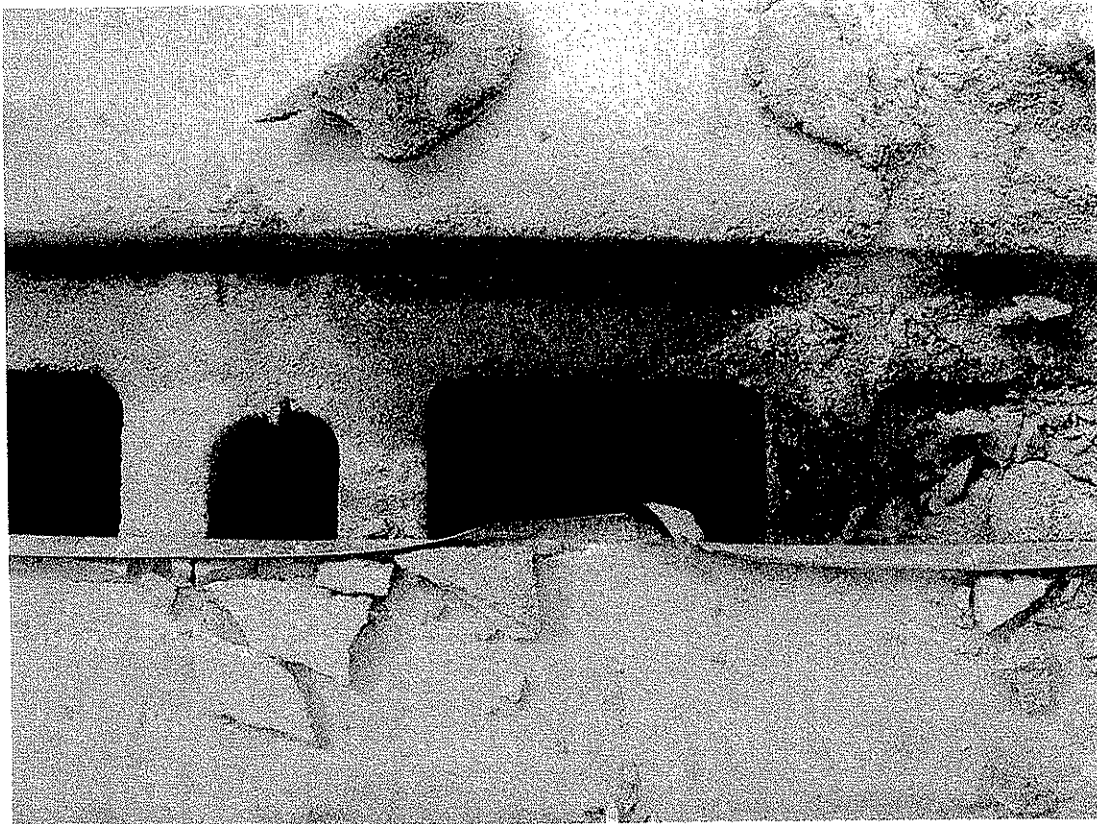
Moisture Present in Wall Below Coping Stone—Note Lack of Through Wall Flashing
